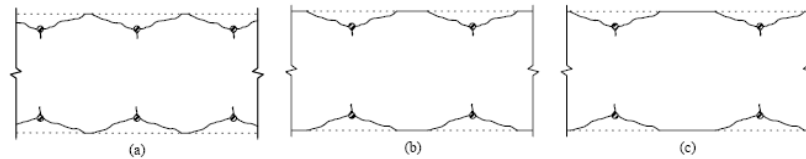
Corrosion of Shear Stirrups Concrete Crack Pattern (Higgins et al., 2003)
